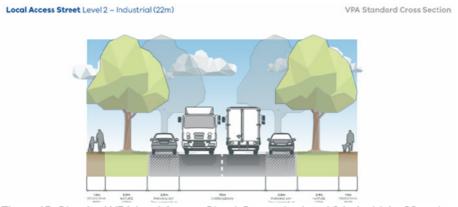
Standard VPA local Access Street Connector Level 2 Industrial - 22 metres
